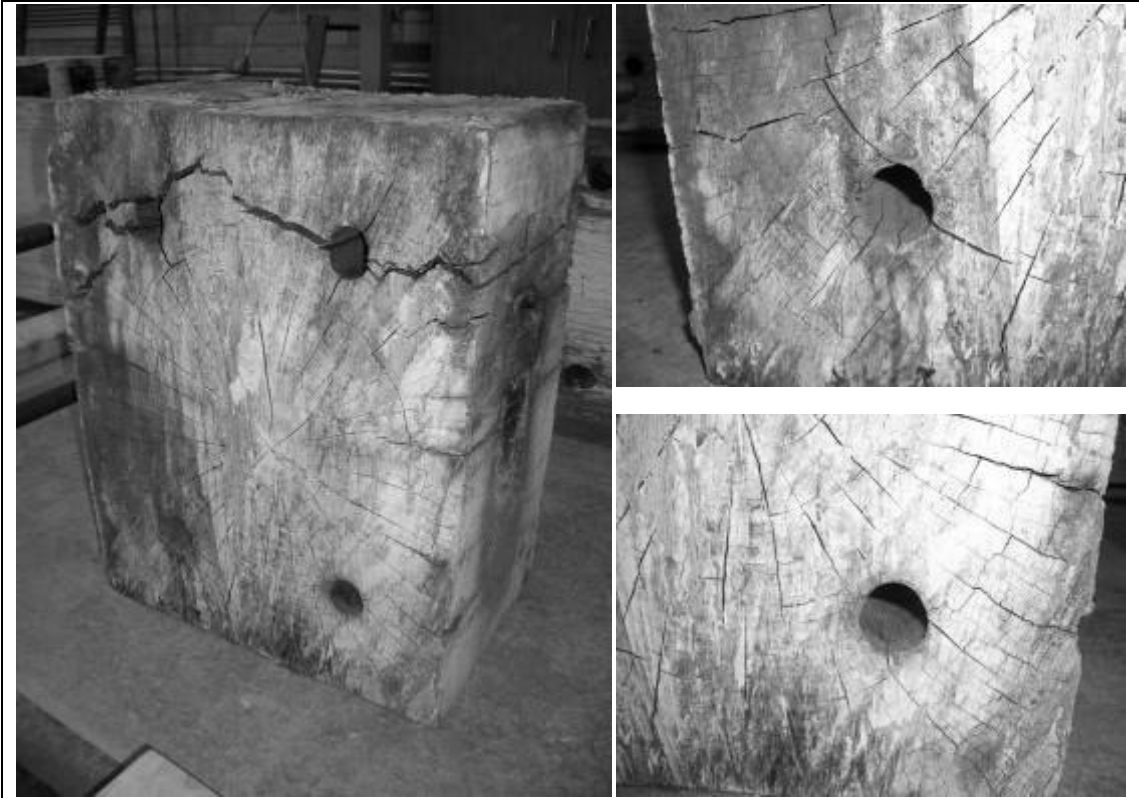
Photographs showing spacer bolt holes after testing in Assembly 03-11
